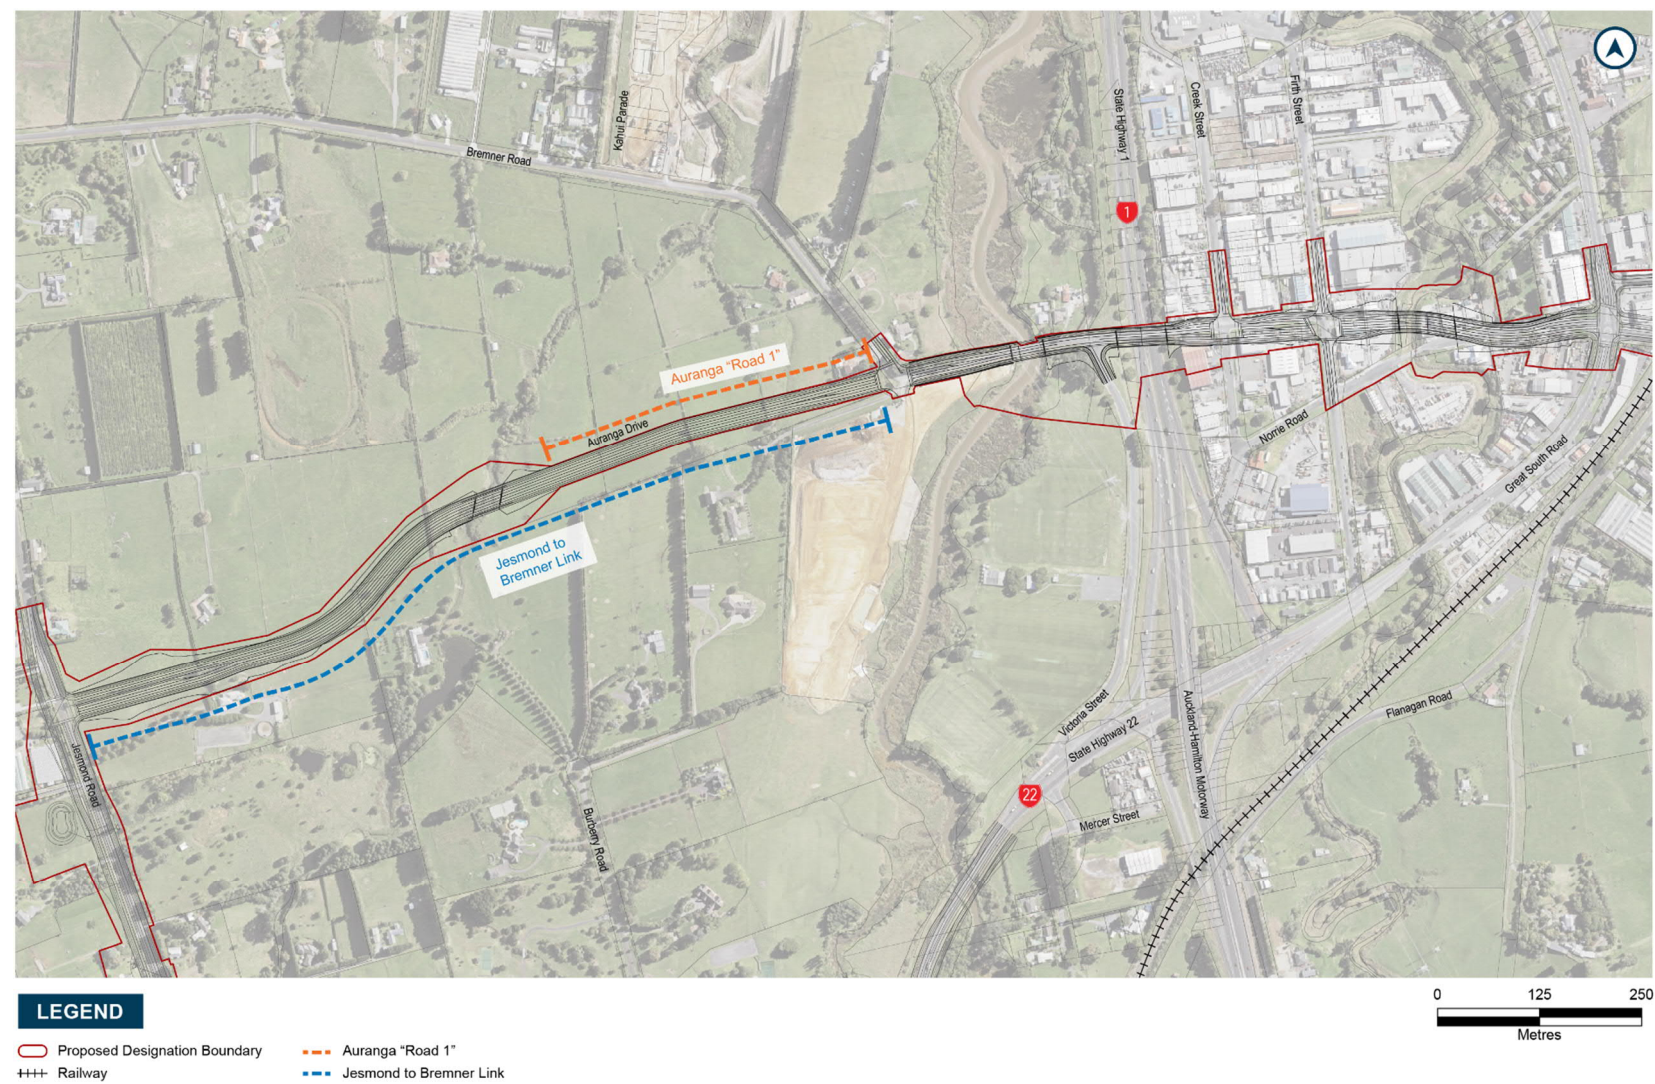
Overview of the Bremner Road FTN Upgrade Section
